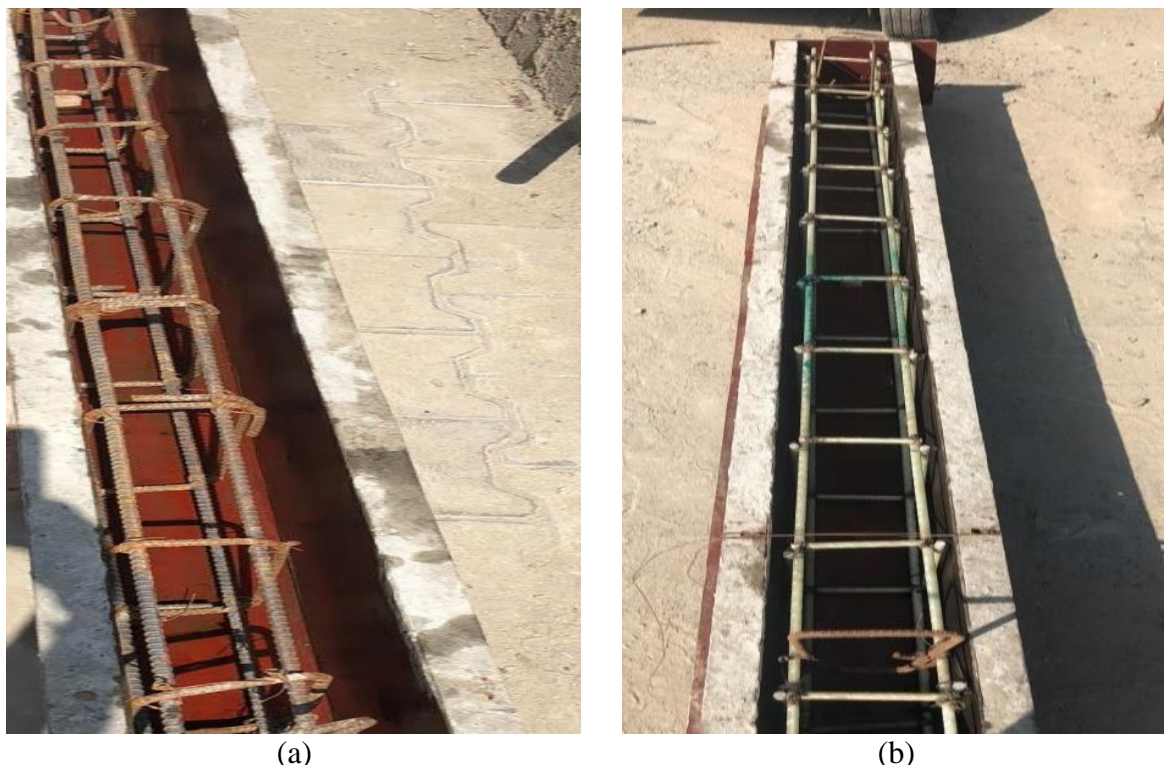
Formwork and (a) steel and (b) GFRP Reinforcement Cages Before Concrete Pouring
